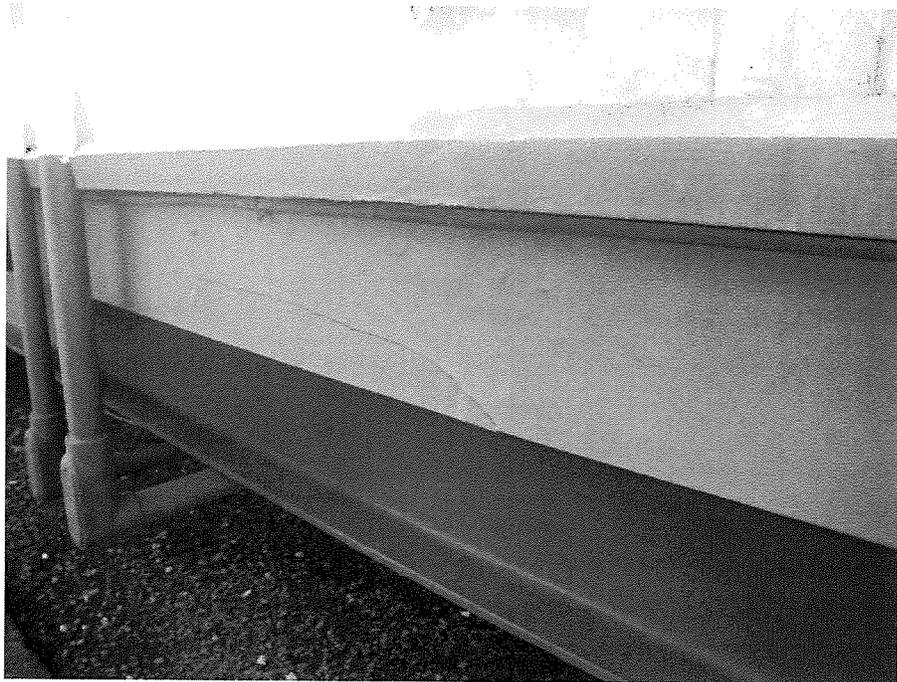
Cracked Fascia (Repair per sheet S-12)
